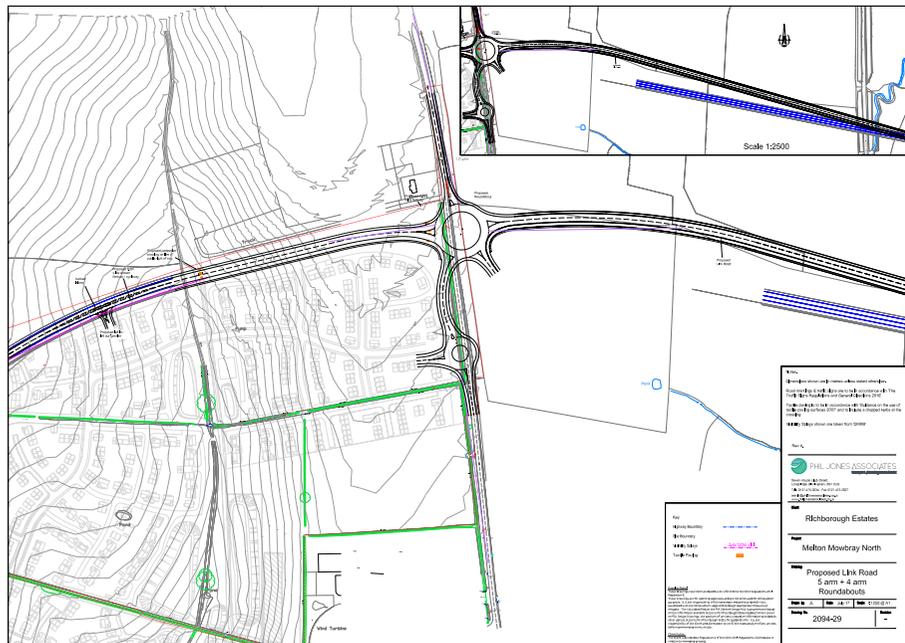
Proposed alternative roundabout arrangements - September 2017.
